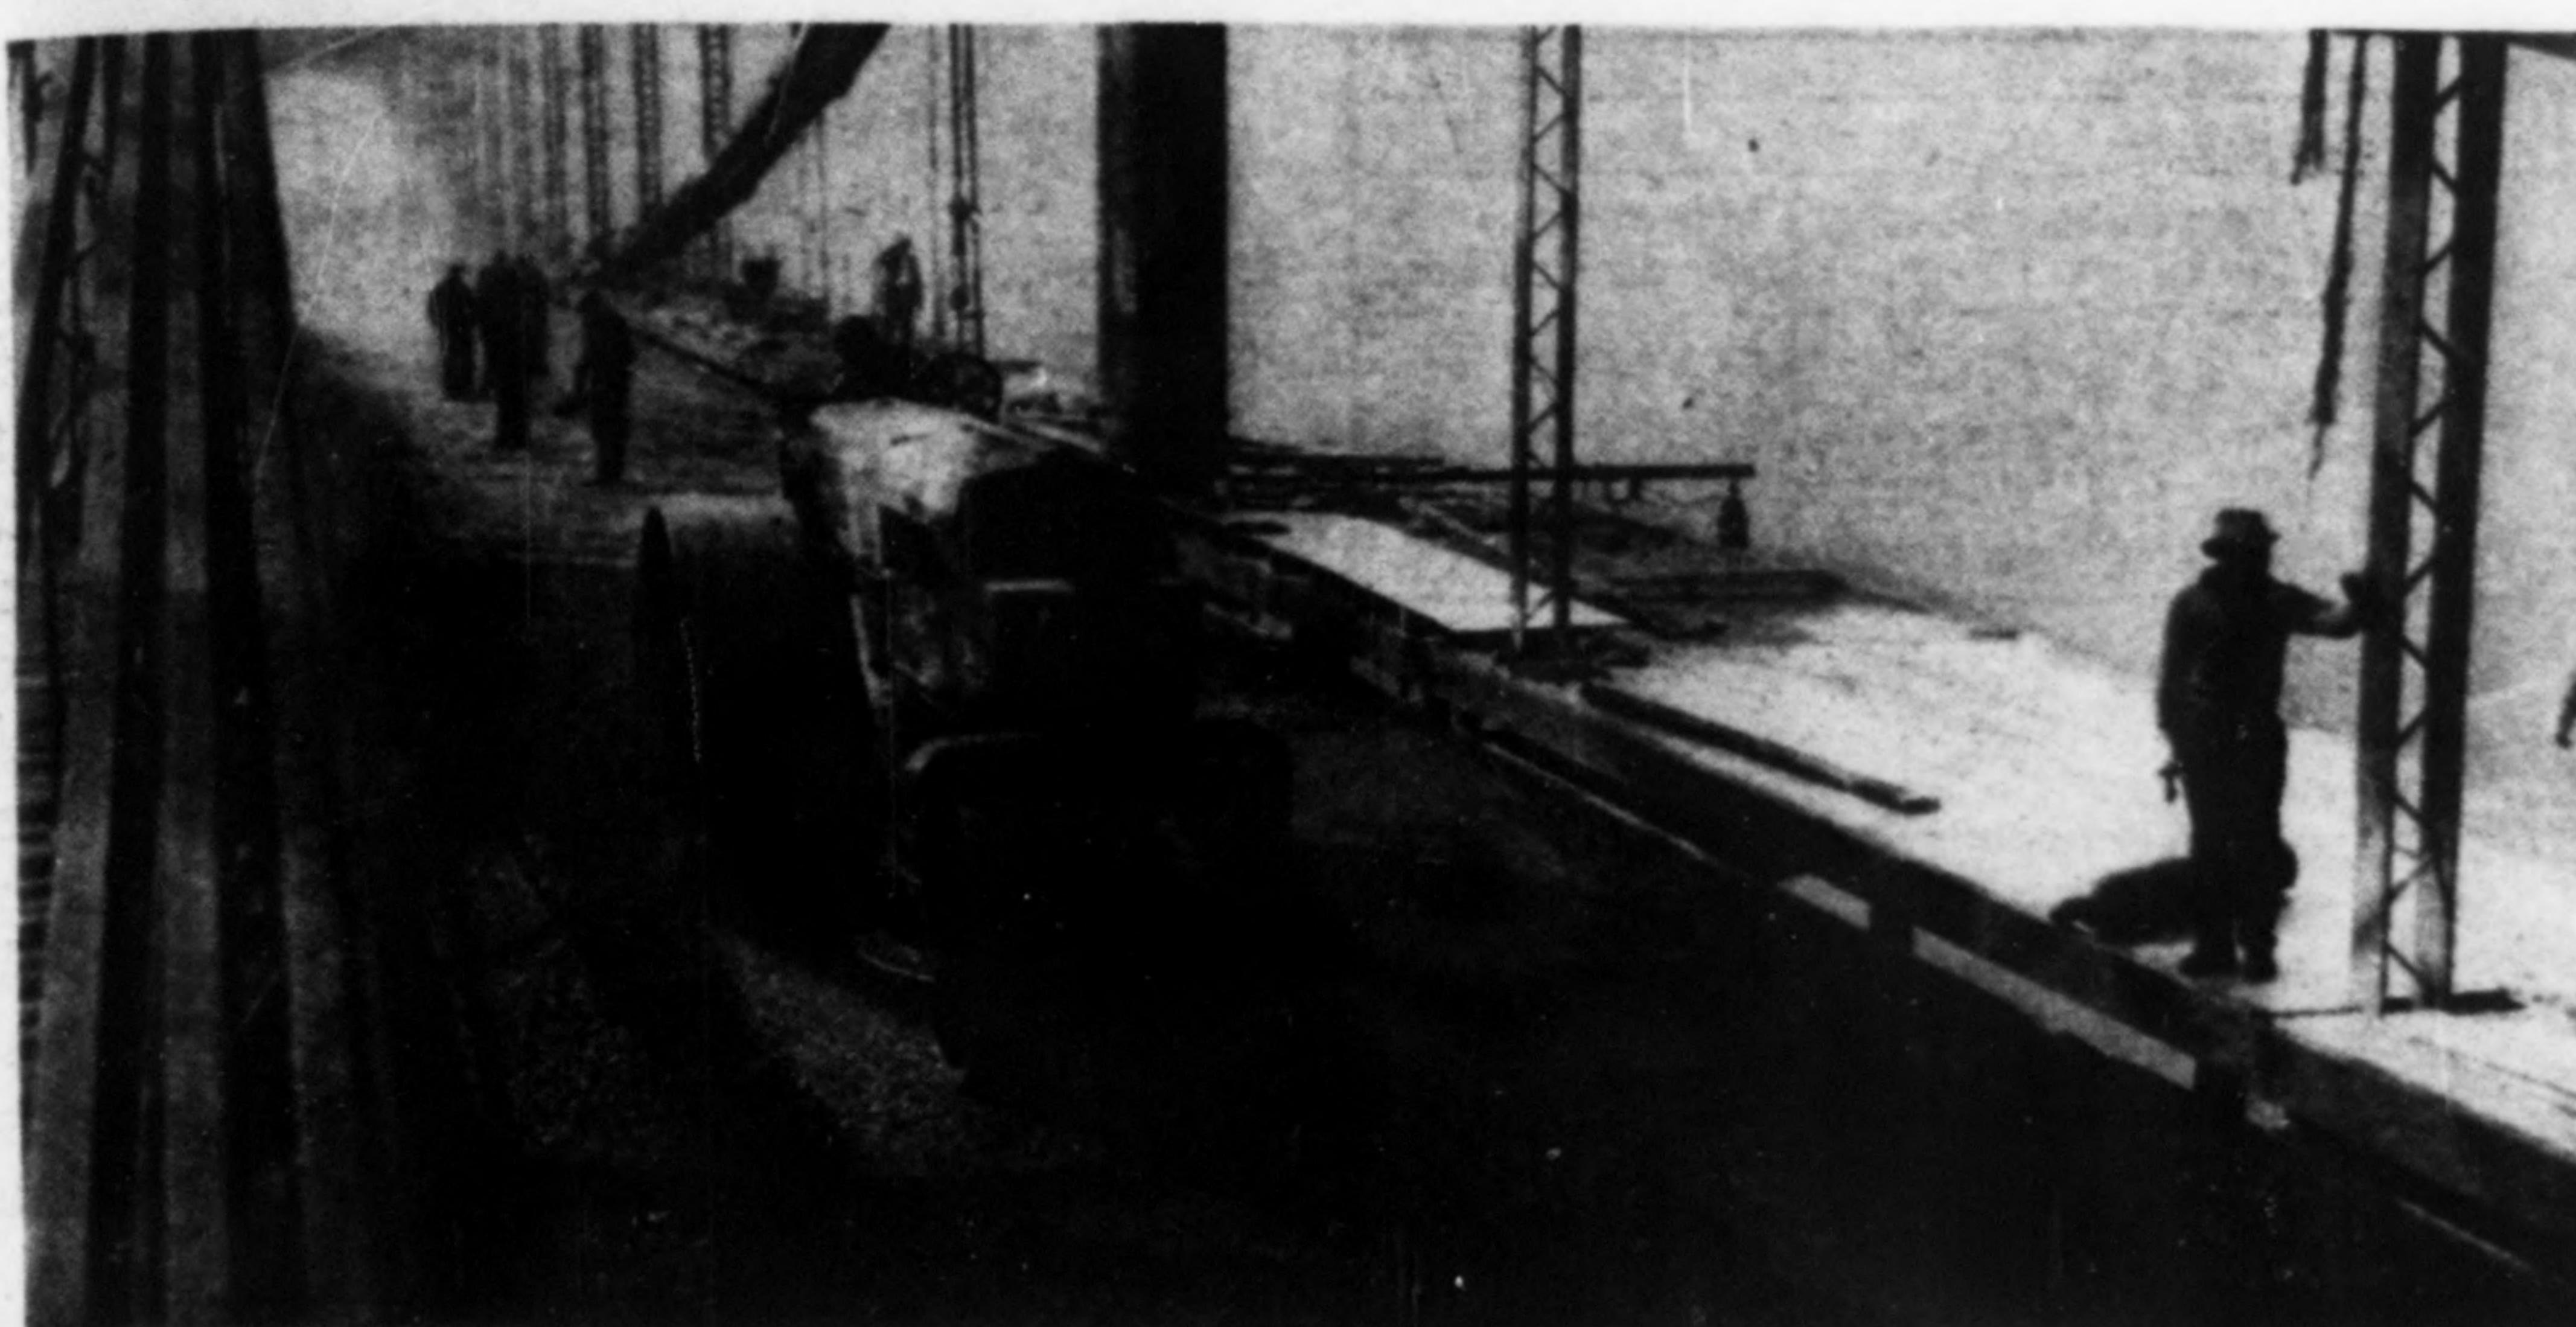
Asphaltic surfacing laid on the roadway slab was compacted by rolling.
